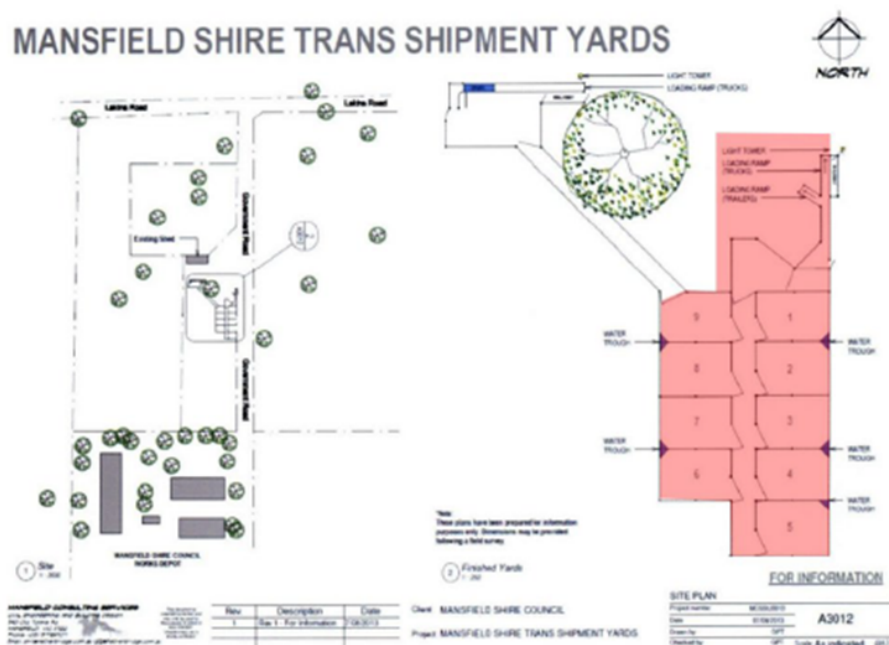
Mansfield Shire Trans-shipment Yards Site Plan, Lakins Road
